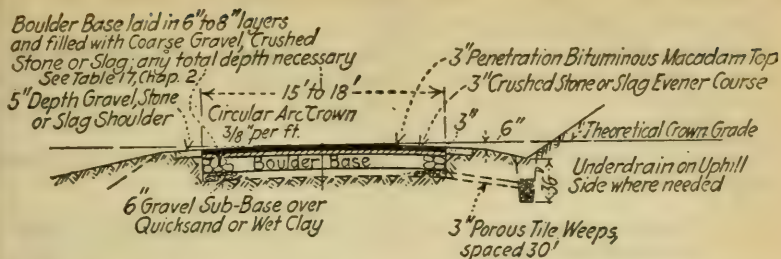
A.—Recommended penetration bituminous macadam pavement section, boulder base construction Class II or IIA traffic. For discussion of crown see page 448.
